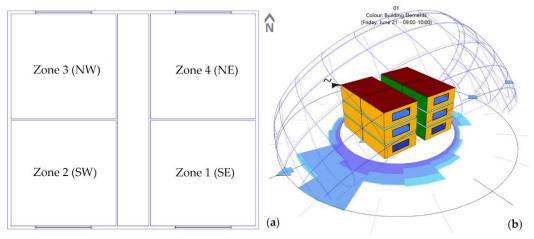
The office building (a) typical floor plan and (b) three-dimensional (3D) view in the case of a 10% window-to-floor (WFR) ratio with assigned north- and south-facing windows.
